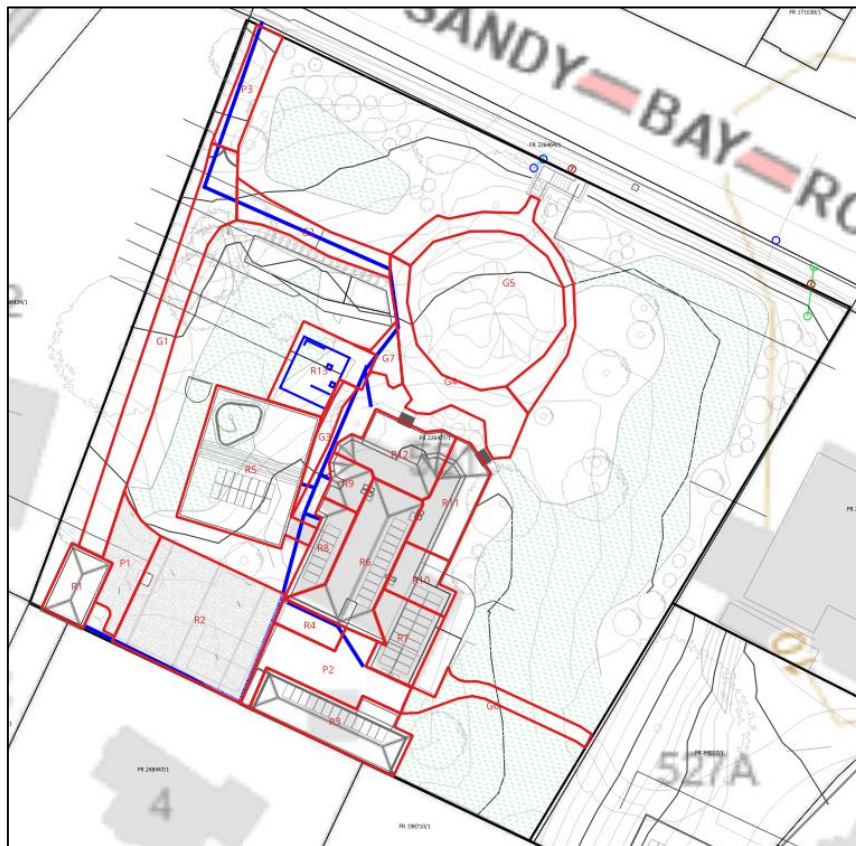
Catchment layout for existing site (521 Sandy Bay Rd)
